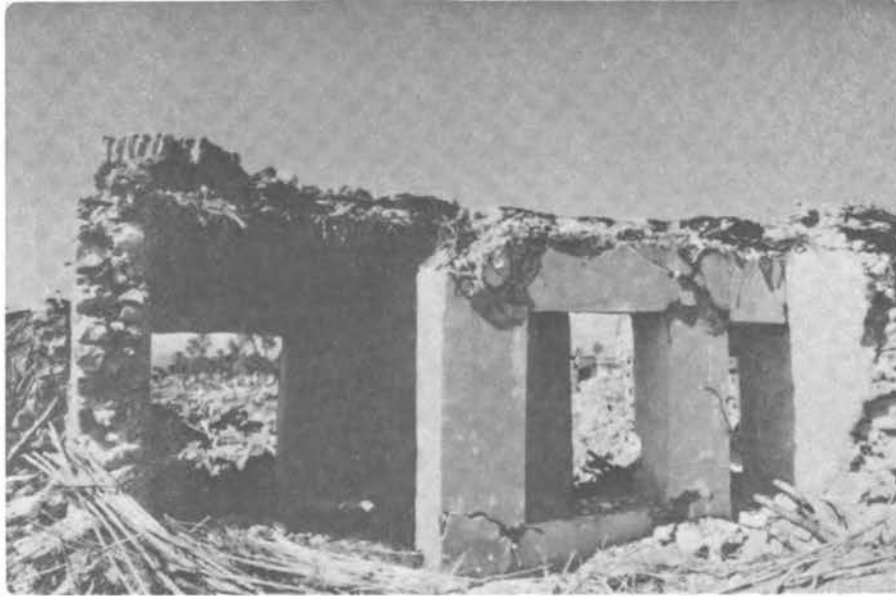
Typical Failure Mode and Crack Shapes of Lintels and Wall Elements.
